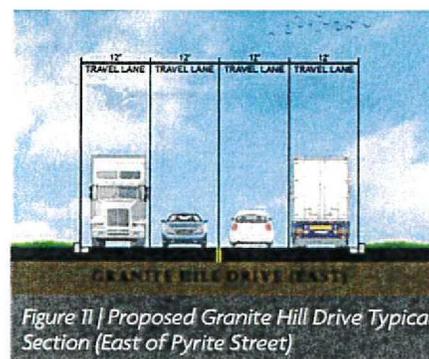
| Proposed Granite Hill Drive Typical Section (East of Pyrite Street)
